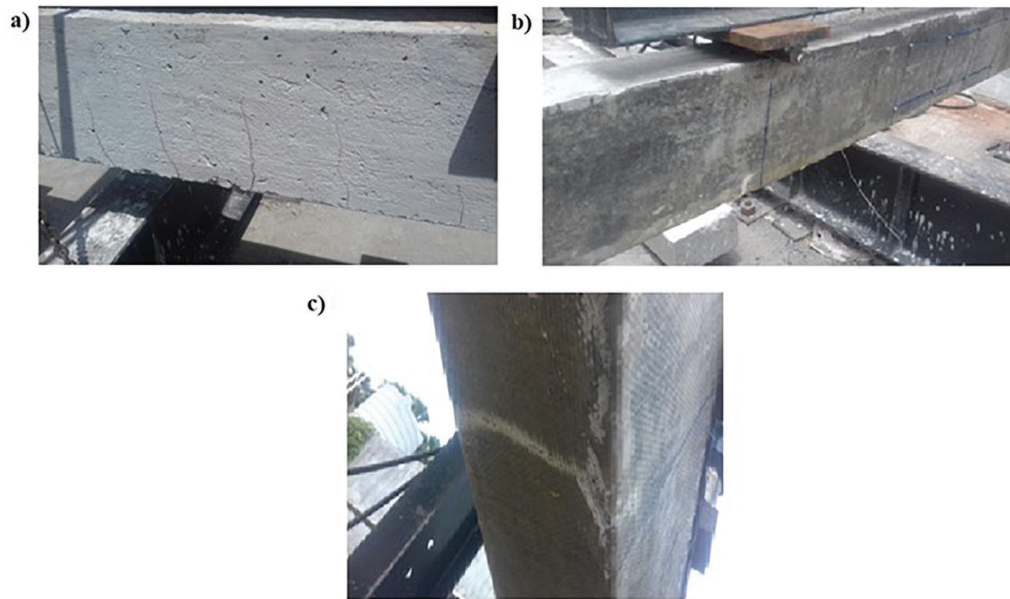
Failure mechanisms of beams. a) controlled beam b) BH2 and c) BH3.
